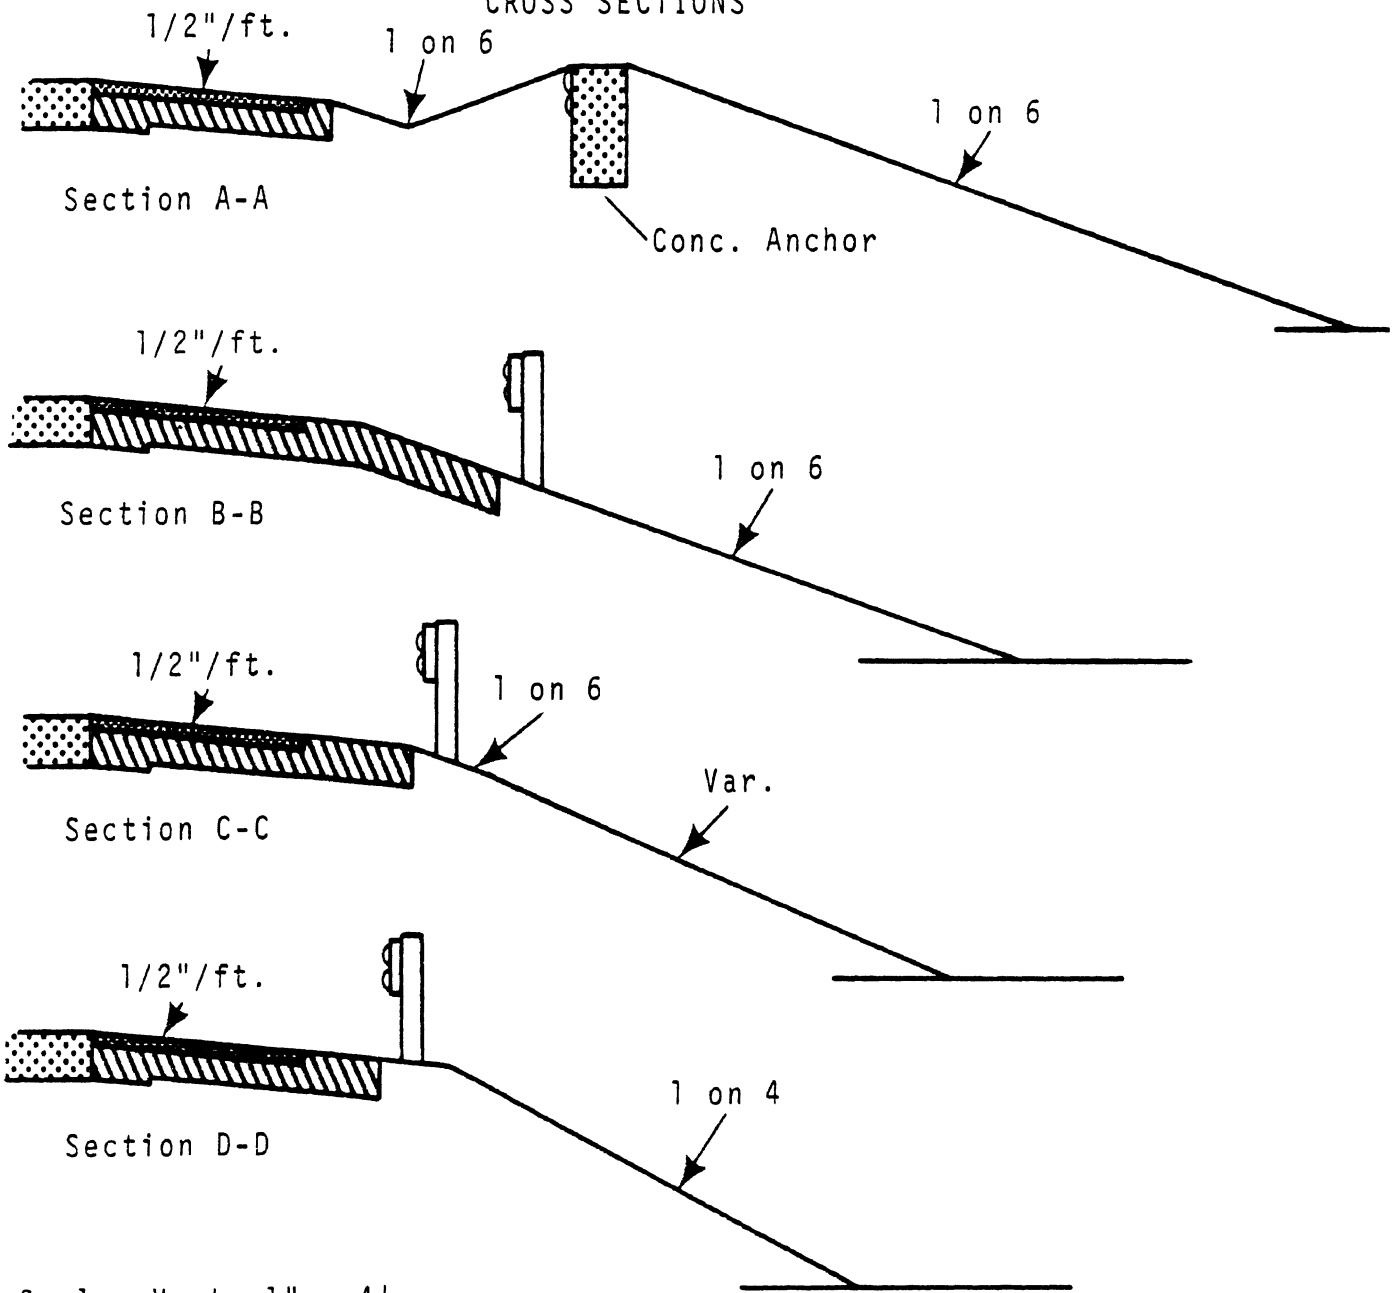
EARTHEN MOUND GUARDRAIL END TREATMENT
